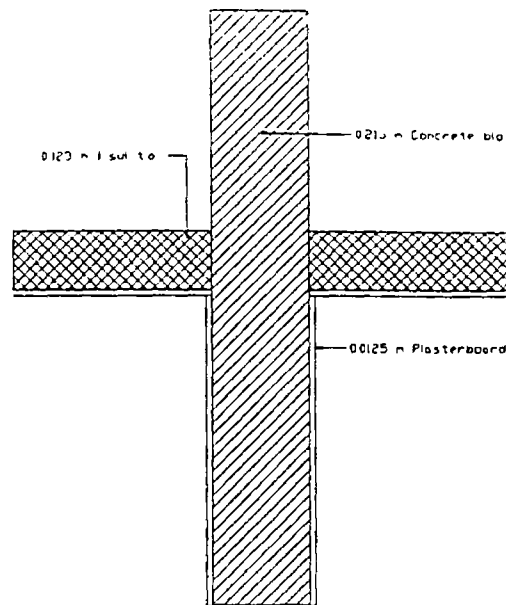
10 1 Semi-Detached House Party Wall to Attic
